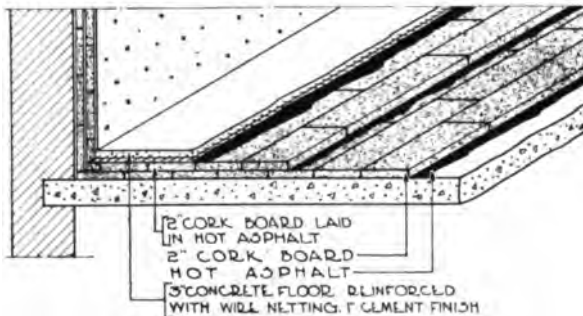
DETAIL OF FLOOR—4" CORK BOARD WITH CONCRETE FINISH.
